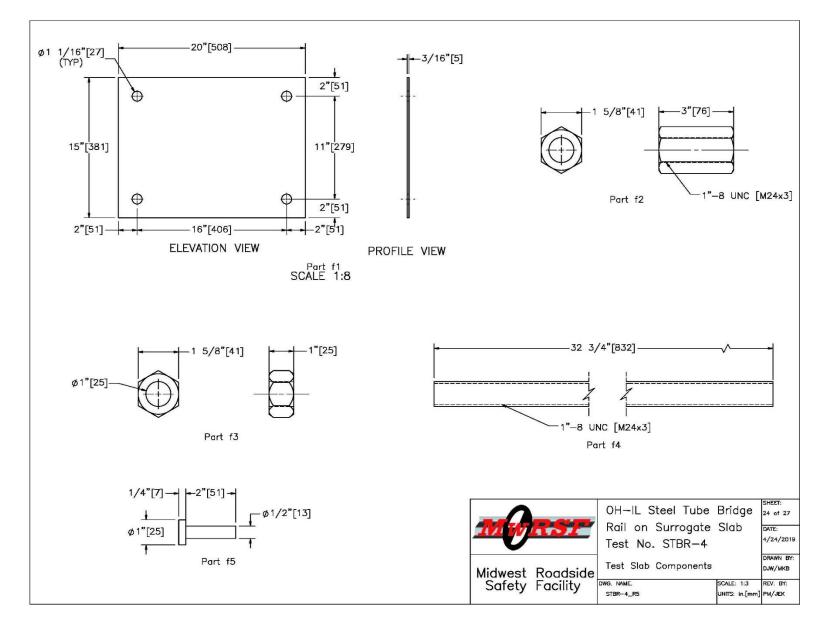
Concrete Connector Plate Components, Test No. STBR-4
